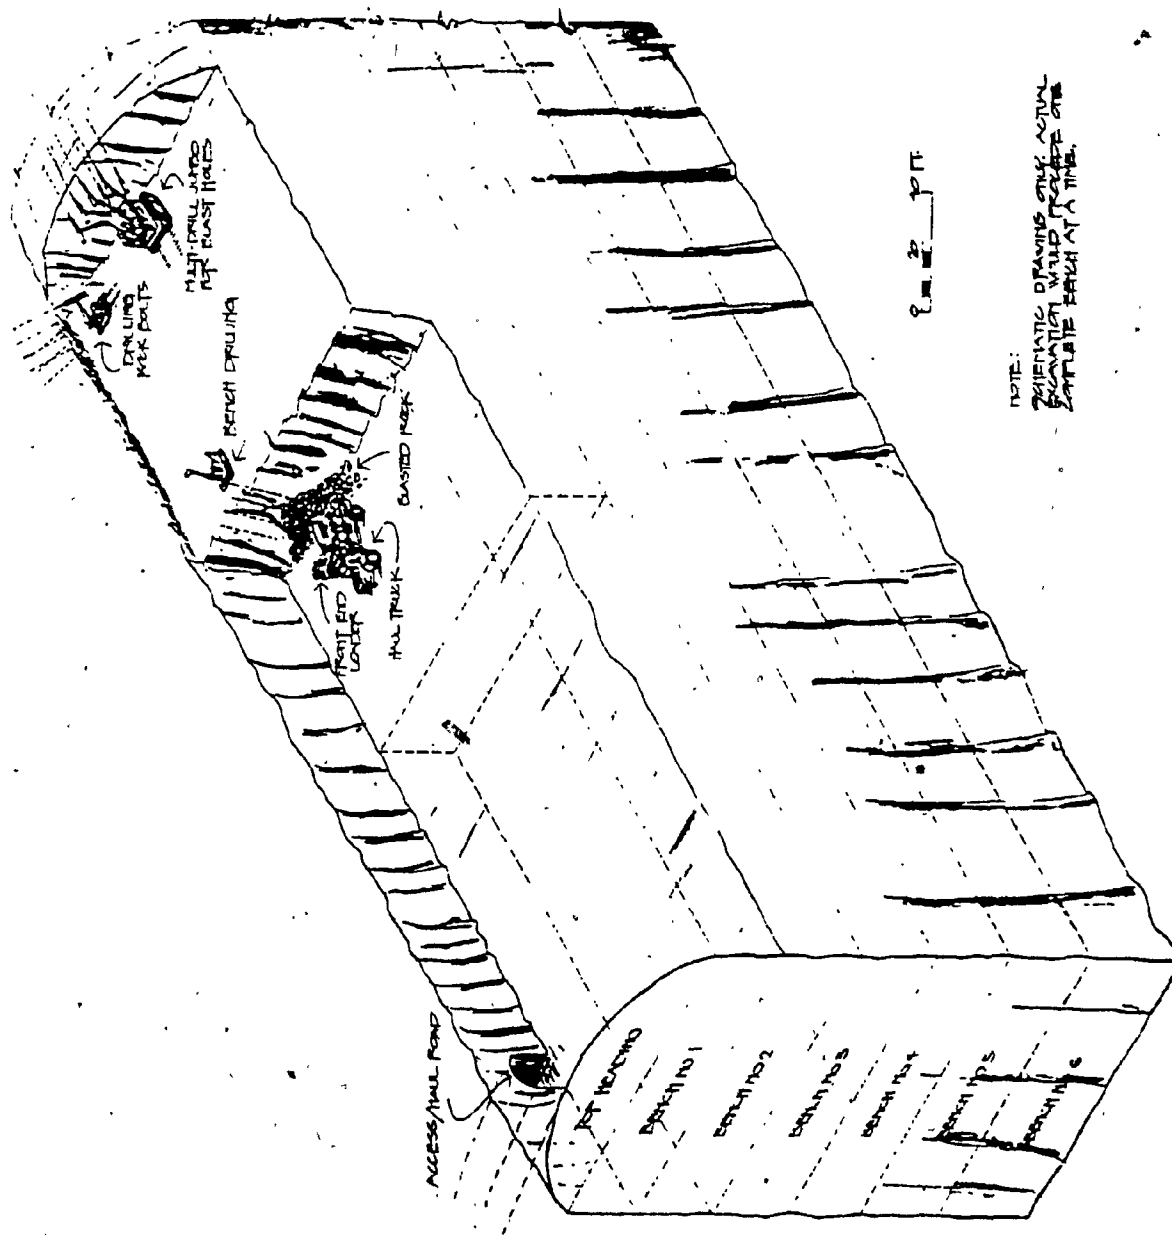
Typical Excavation Procedure - Heading and Bench
